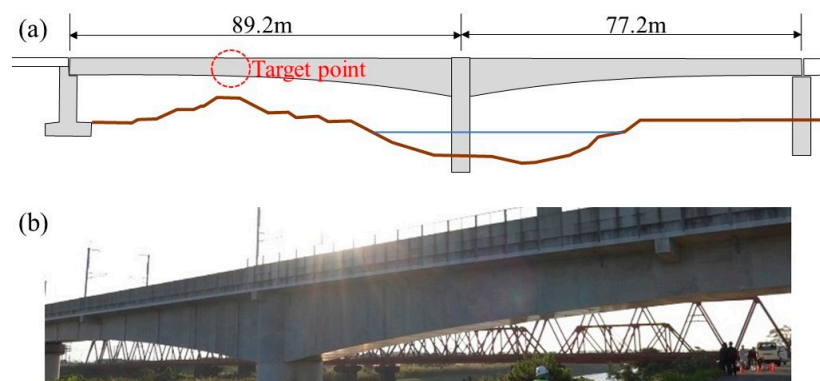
Outline of bridge B: (a) bridge span and sketch, (b) view of bridge A.
